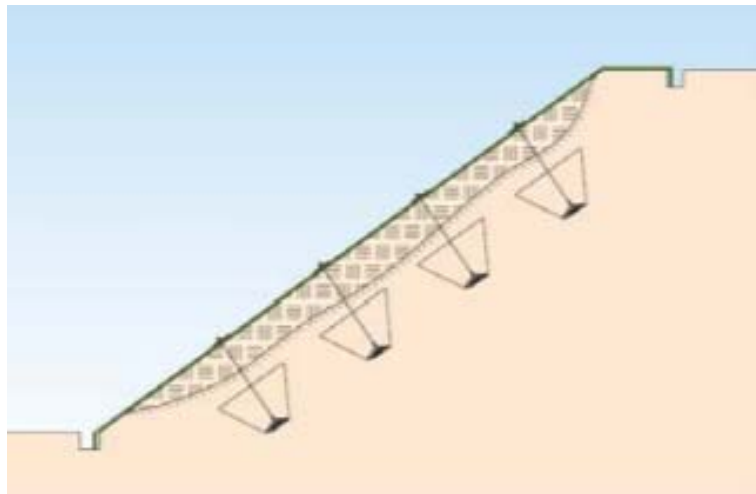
Earth anchors for slope stabilization (Titi and Helwany 2007)
